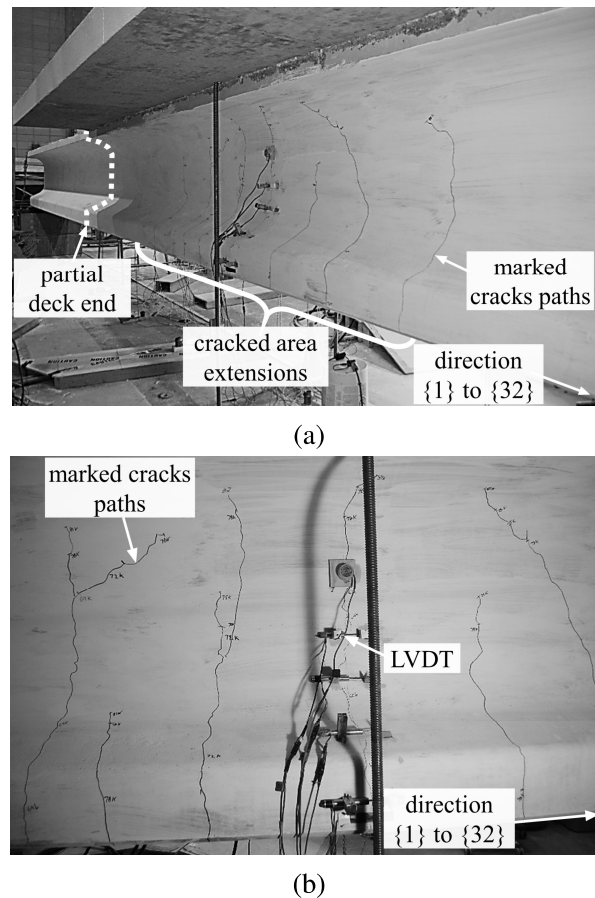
Crack pattern on BTC60 specimen under damage 1 condition: (a) side view and (b) detail of cracked area.
